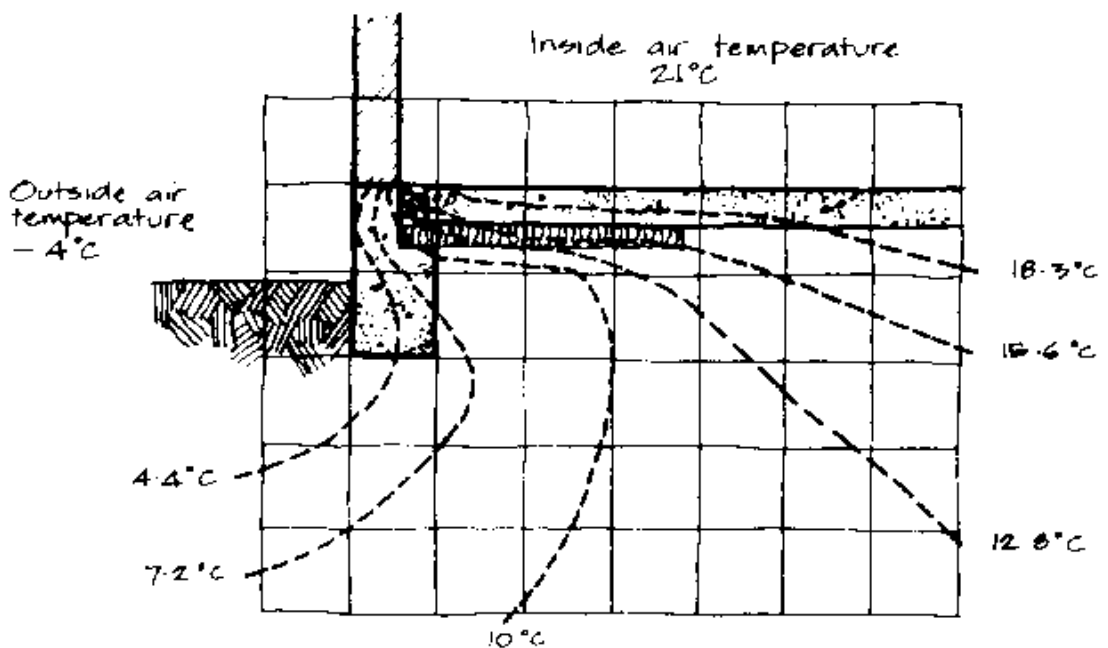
A schematic diagram of soil temperature profiles under a lightweight building with concrete slab on ground floor
